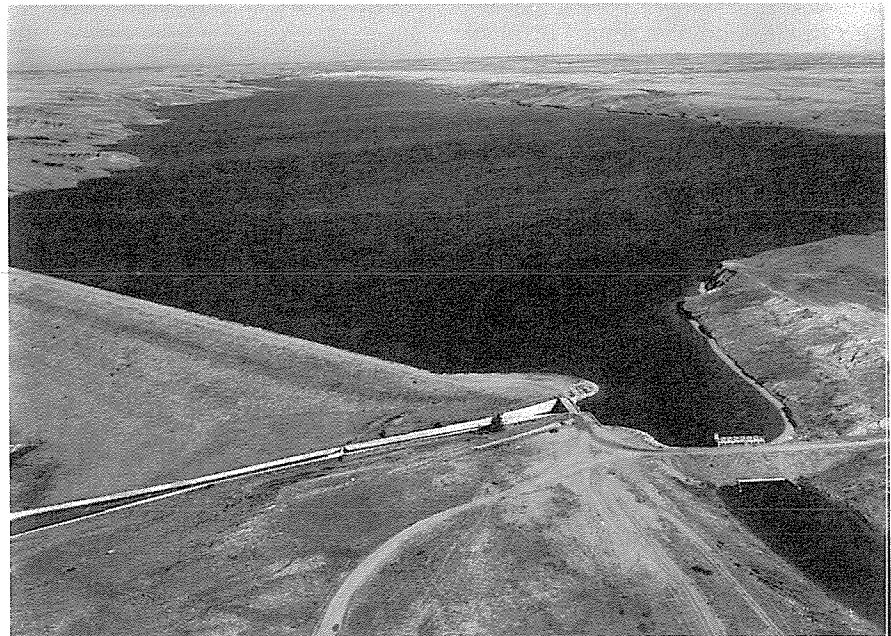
Travers Dam in southern Alberta constructed on Bearpaw Shale.
